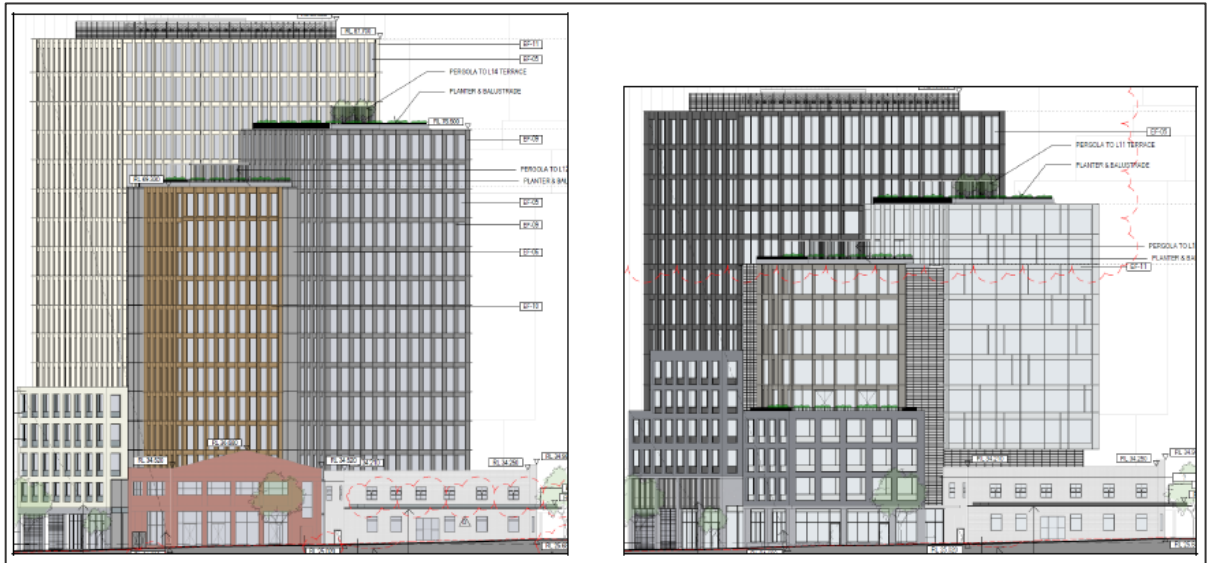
Queensberry Street (north) Elevation - Application Plans (left) Discussion Plans (right)
